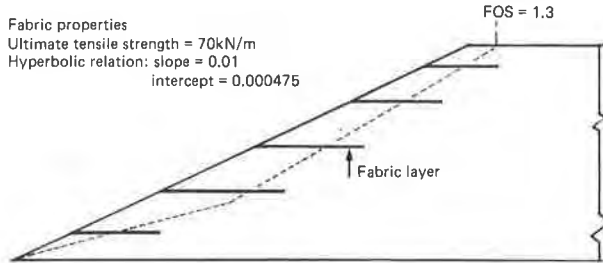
Cohesive fill embankment reinforced by high strength fabric
